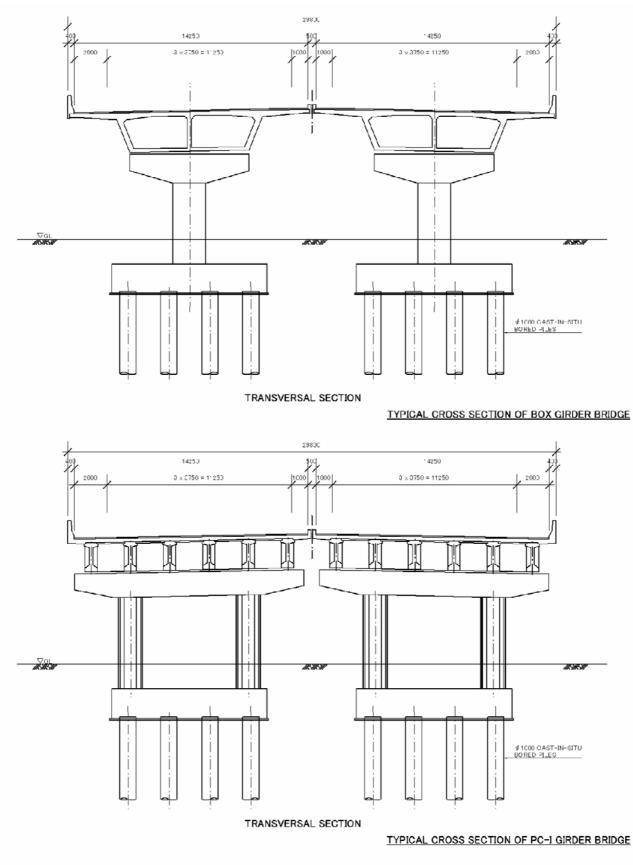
Structural Arrangement of Red River Bridge for RR4 (3/3)
